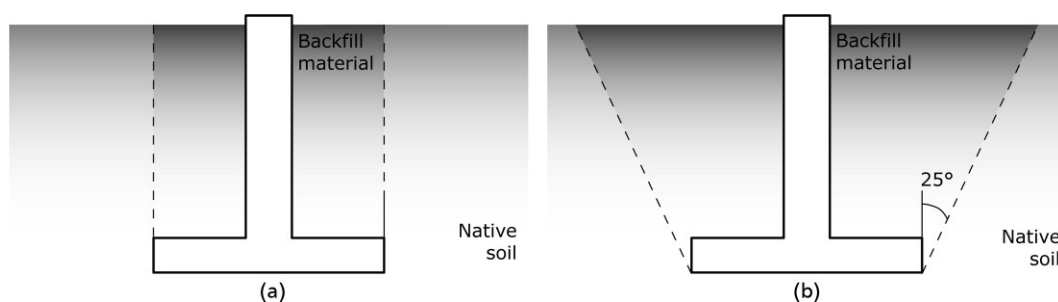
Foundation and backfilled material configurations: (a) vertical backfill; (b) 25° sloped backfill
